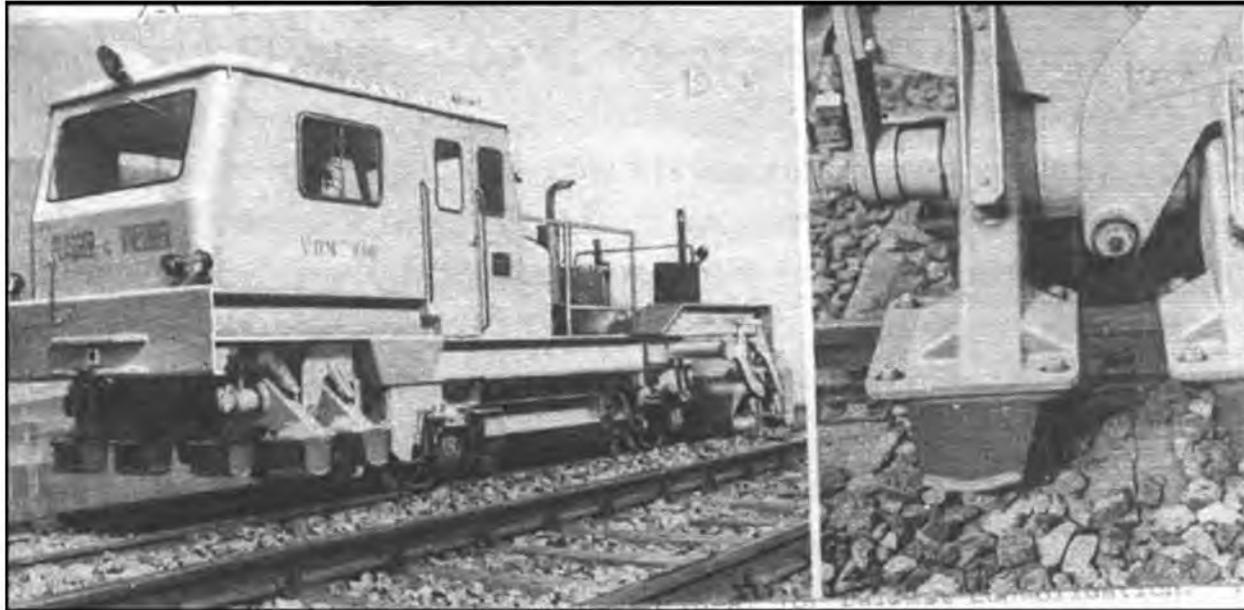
Sleeper crib and shoulder consolidating machine
